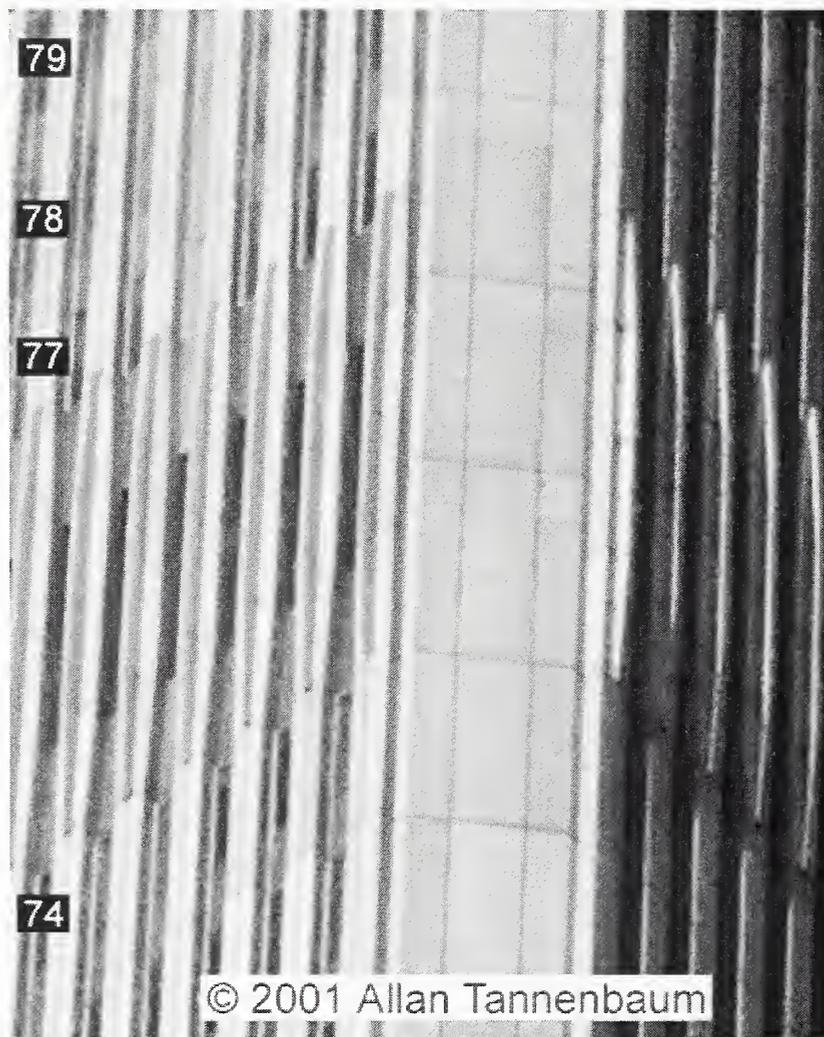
This cropped photograph shows the northeast corner of WTC 2 in the vicinity of the mechanical equipment room on the 75th and 76th floors. Floor numbers have been added.
